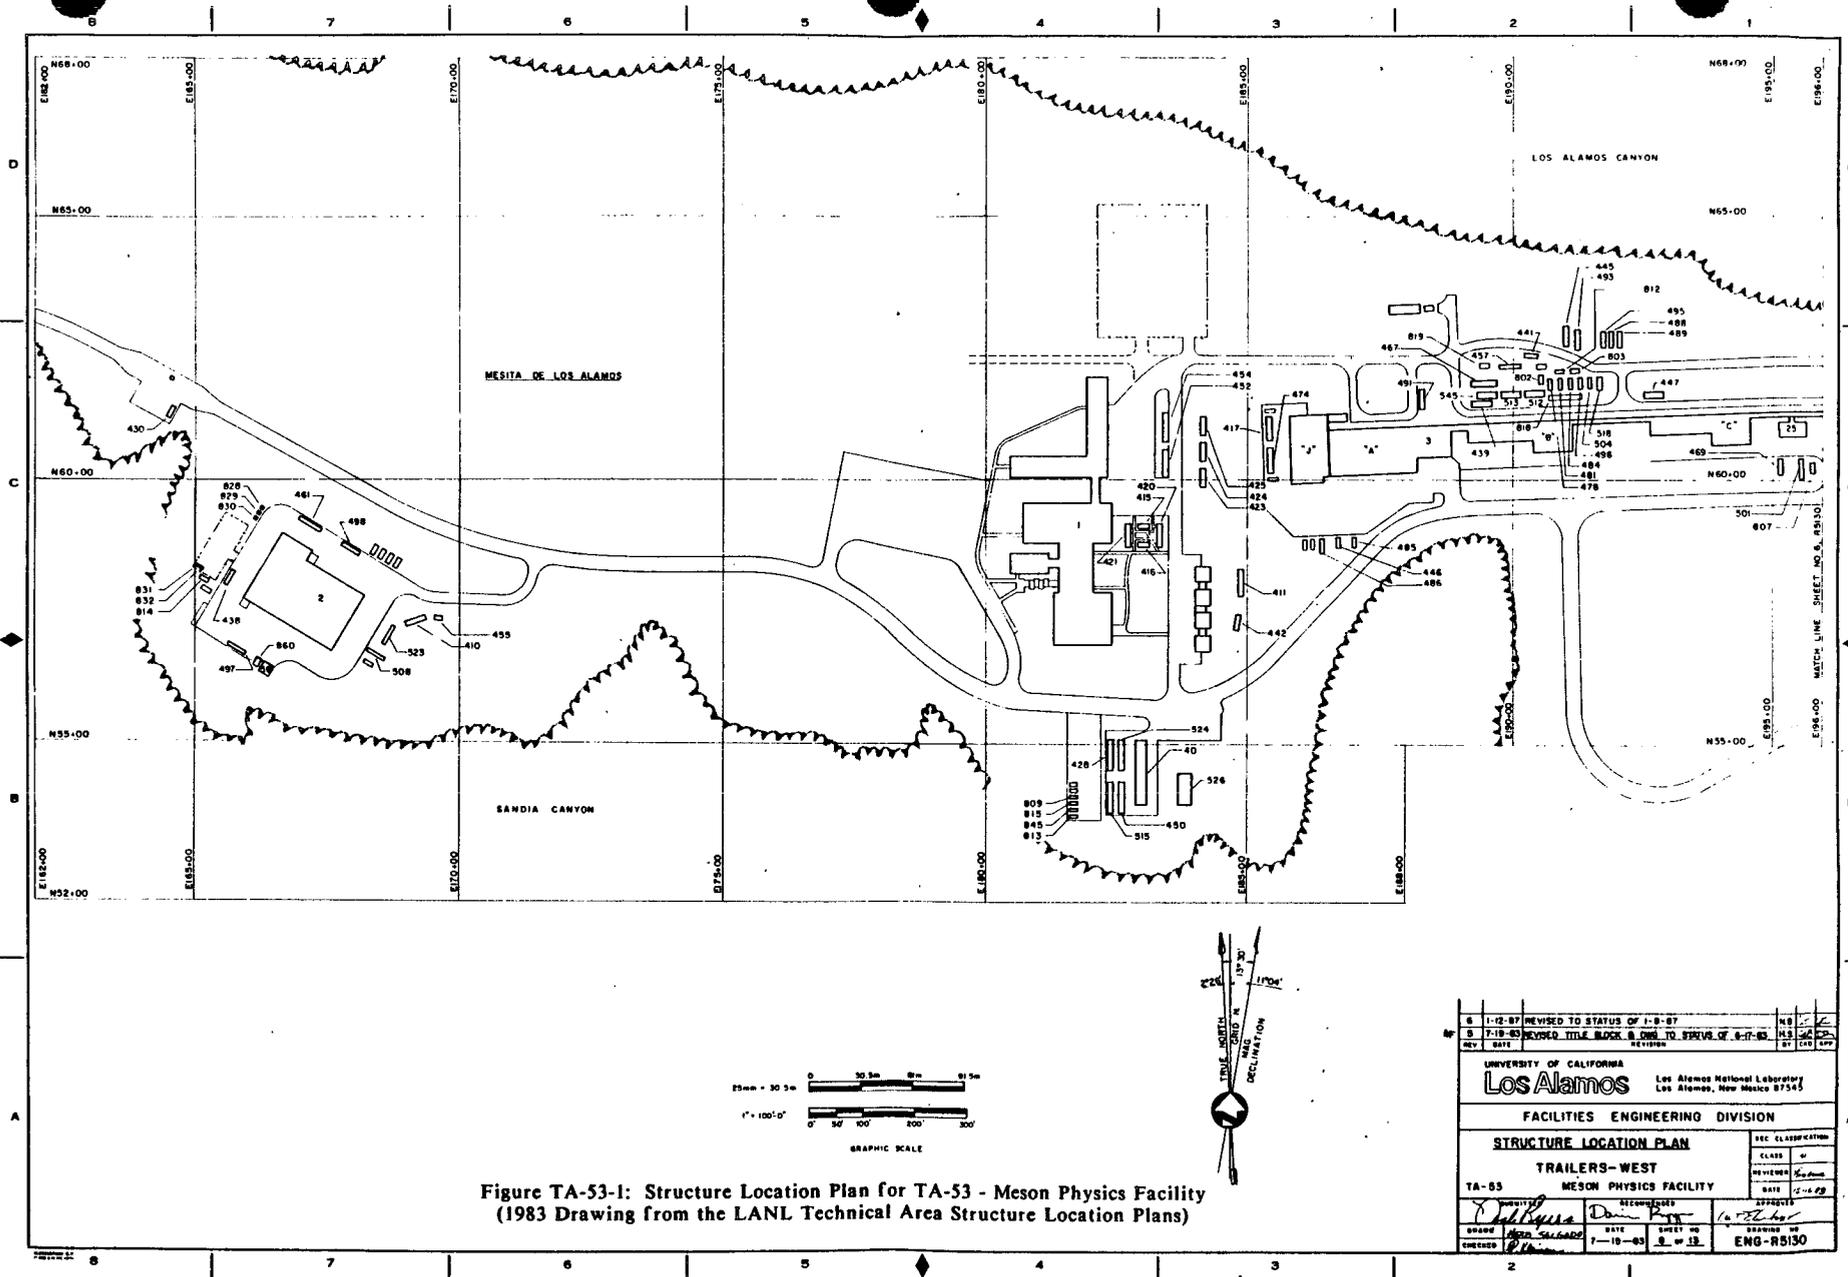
Structure Location Plan for TA-53 - Meson Physics Facility
